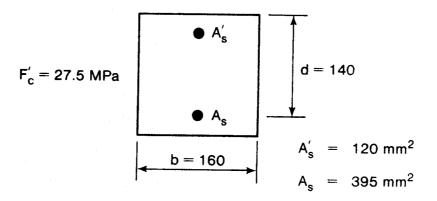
Details of One Element of the Simplified Cross-Sectional Slab Model
